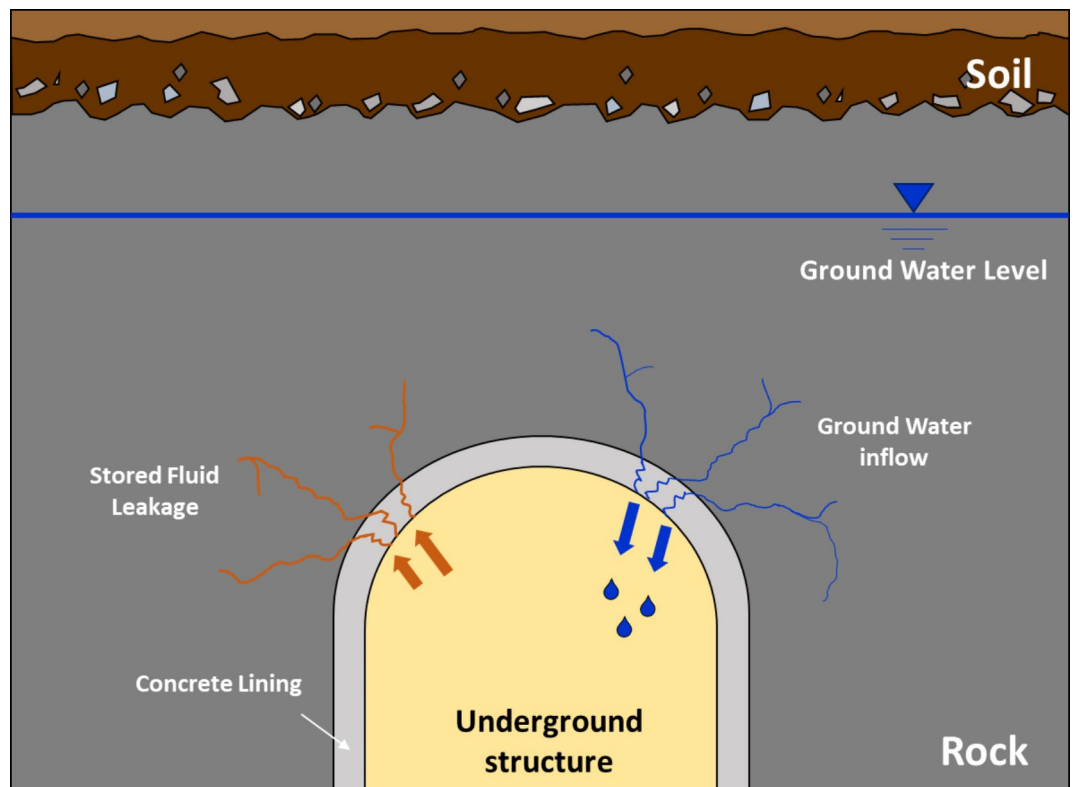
Example of ground water inflow and stored fluid leakage through the crack in concrete material in an underground structure.
